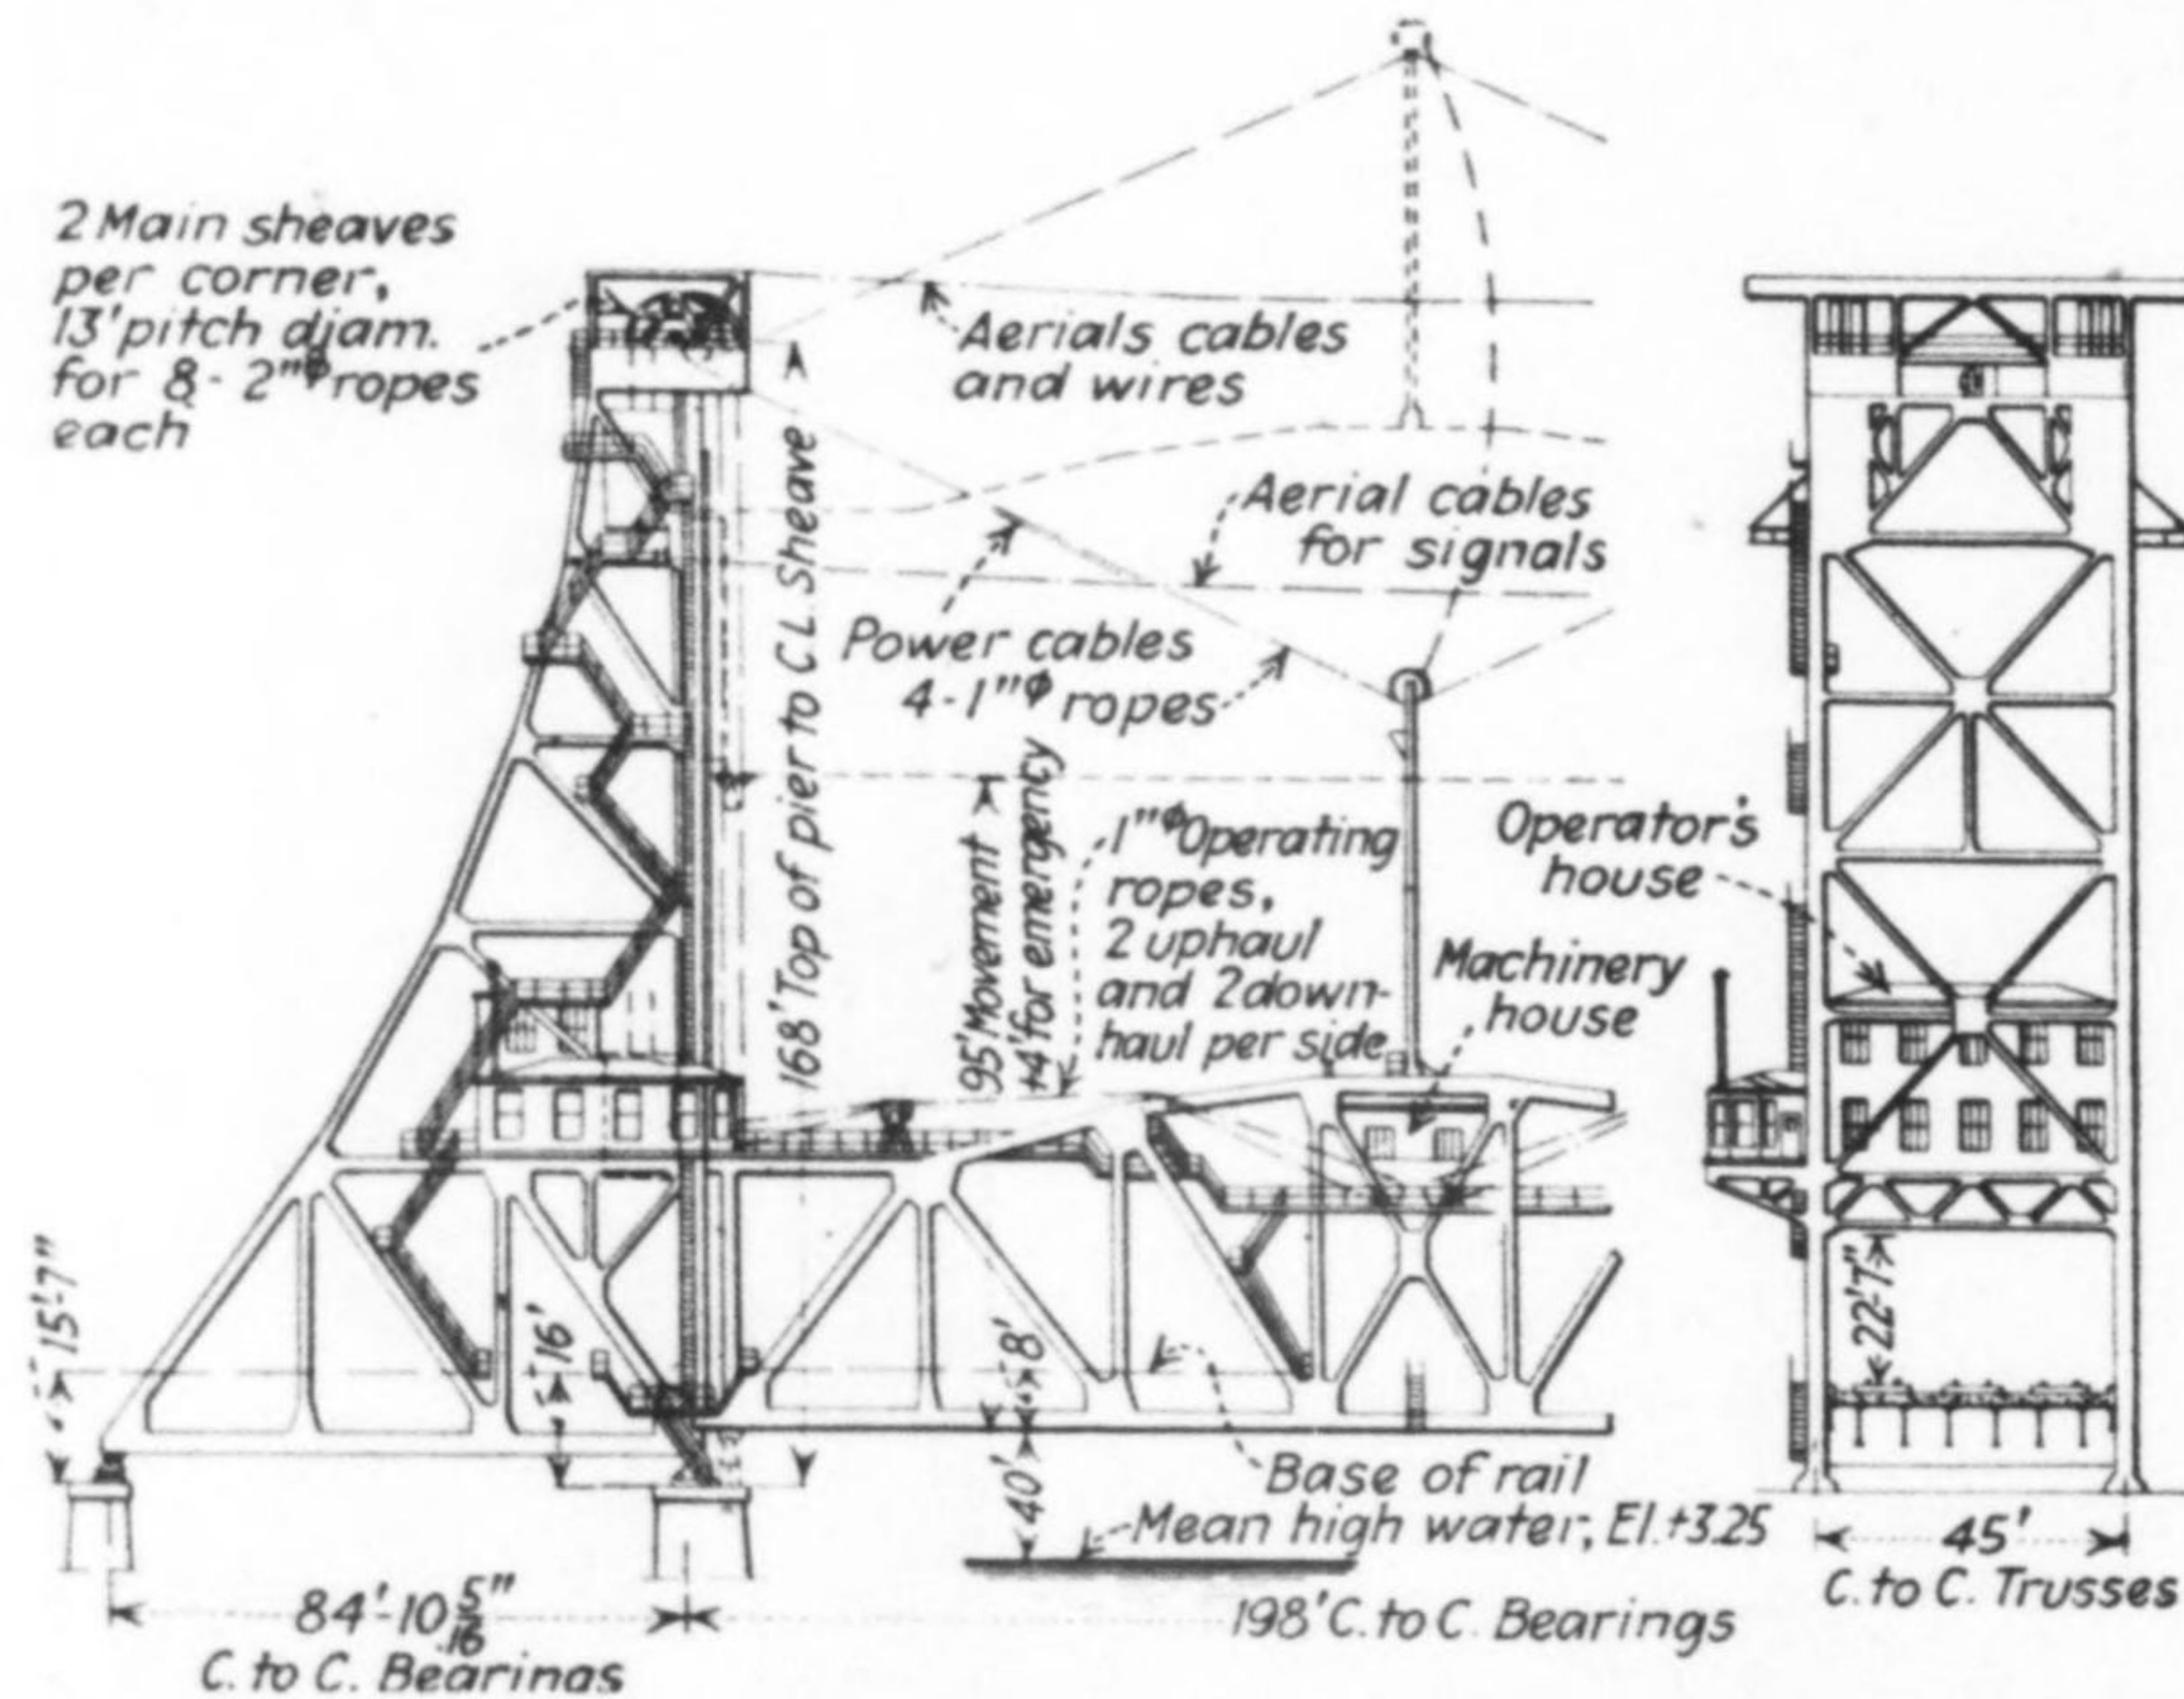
DETAIL OF LIFT SPAN AND EAST TOWER
